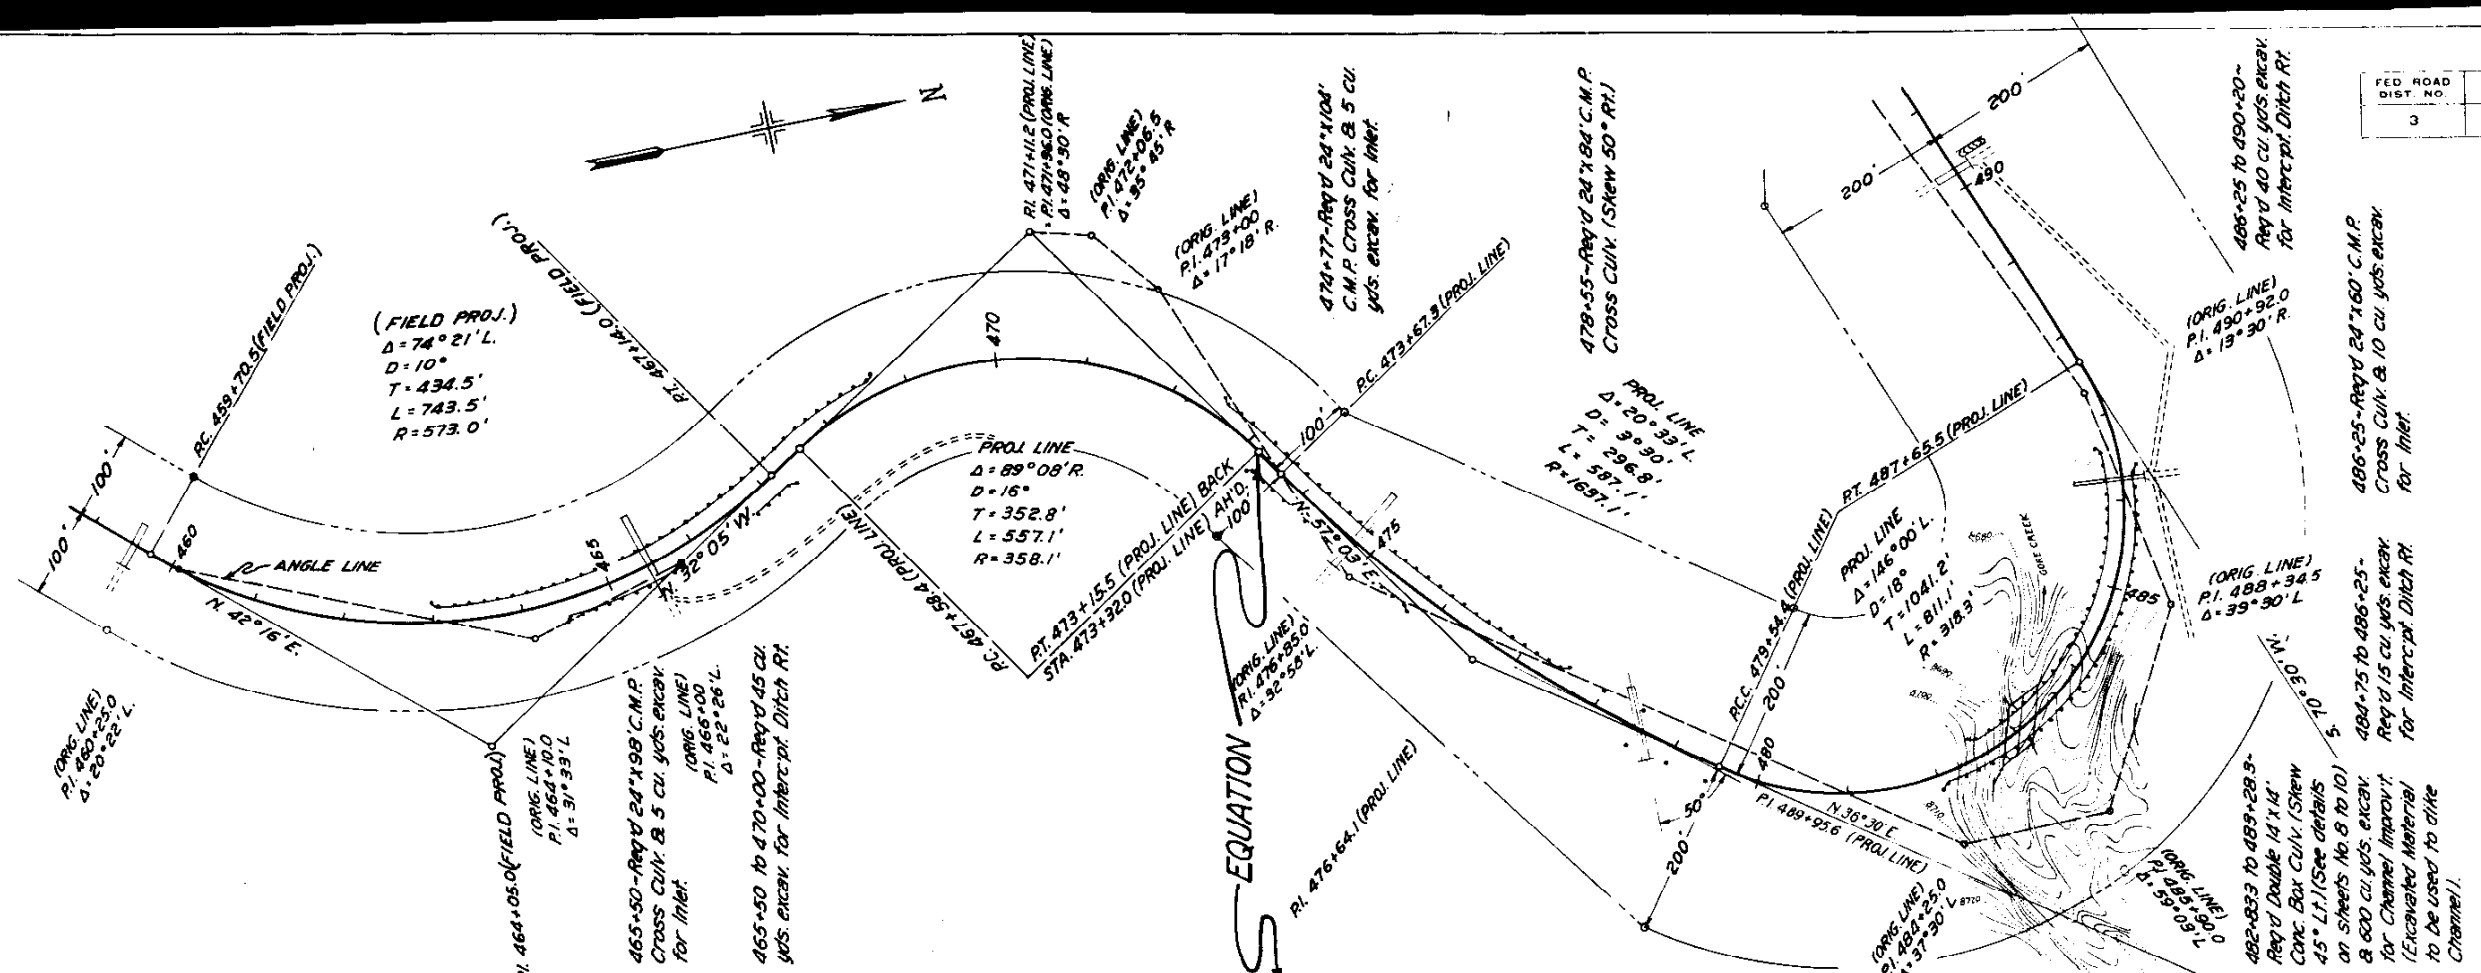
PLAN PROFILE OF P.R.R. STANDARD
